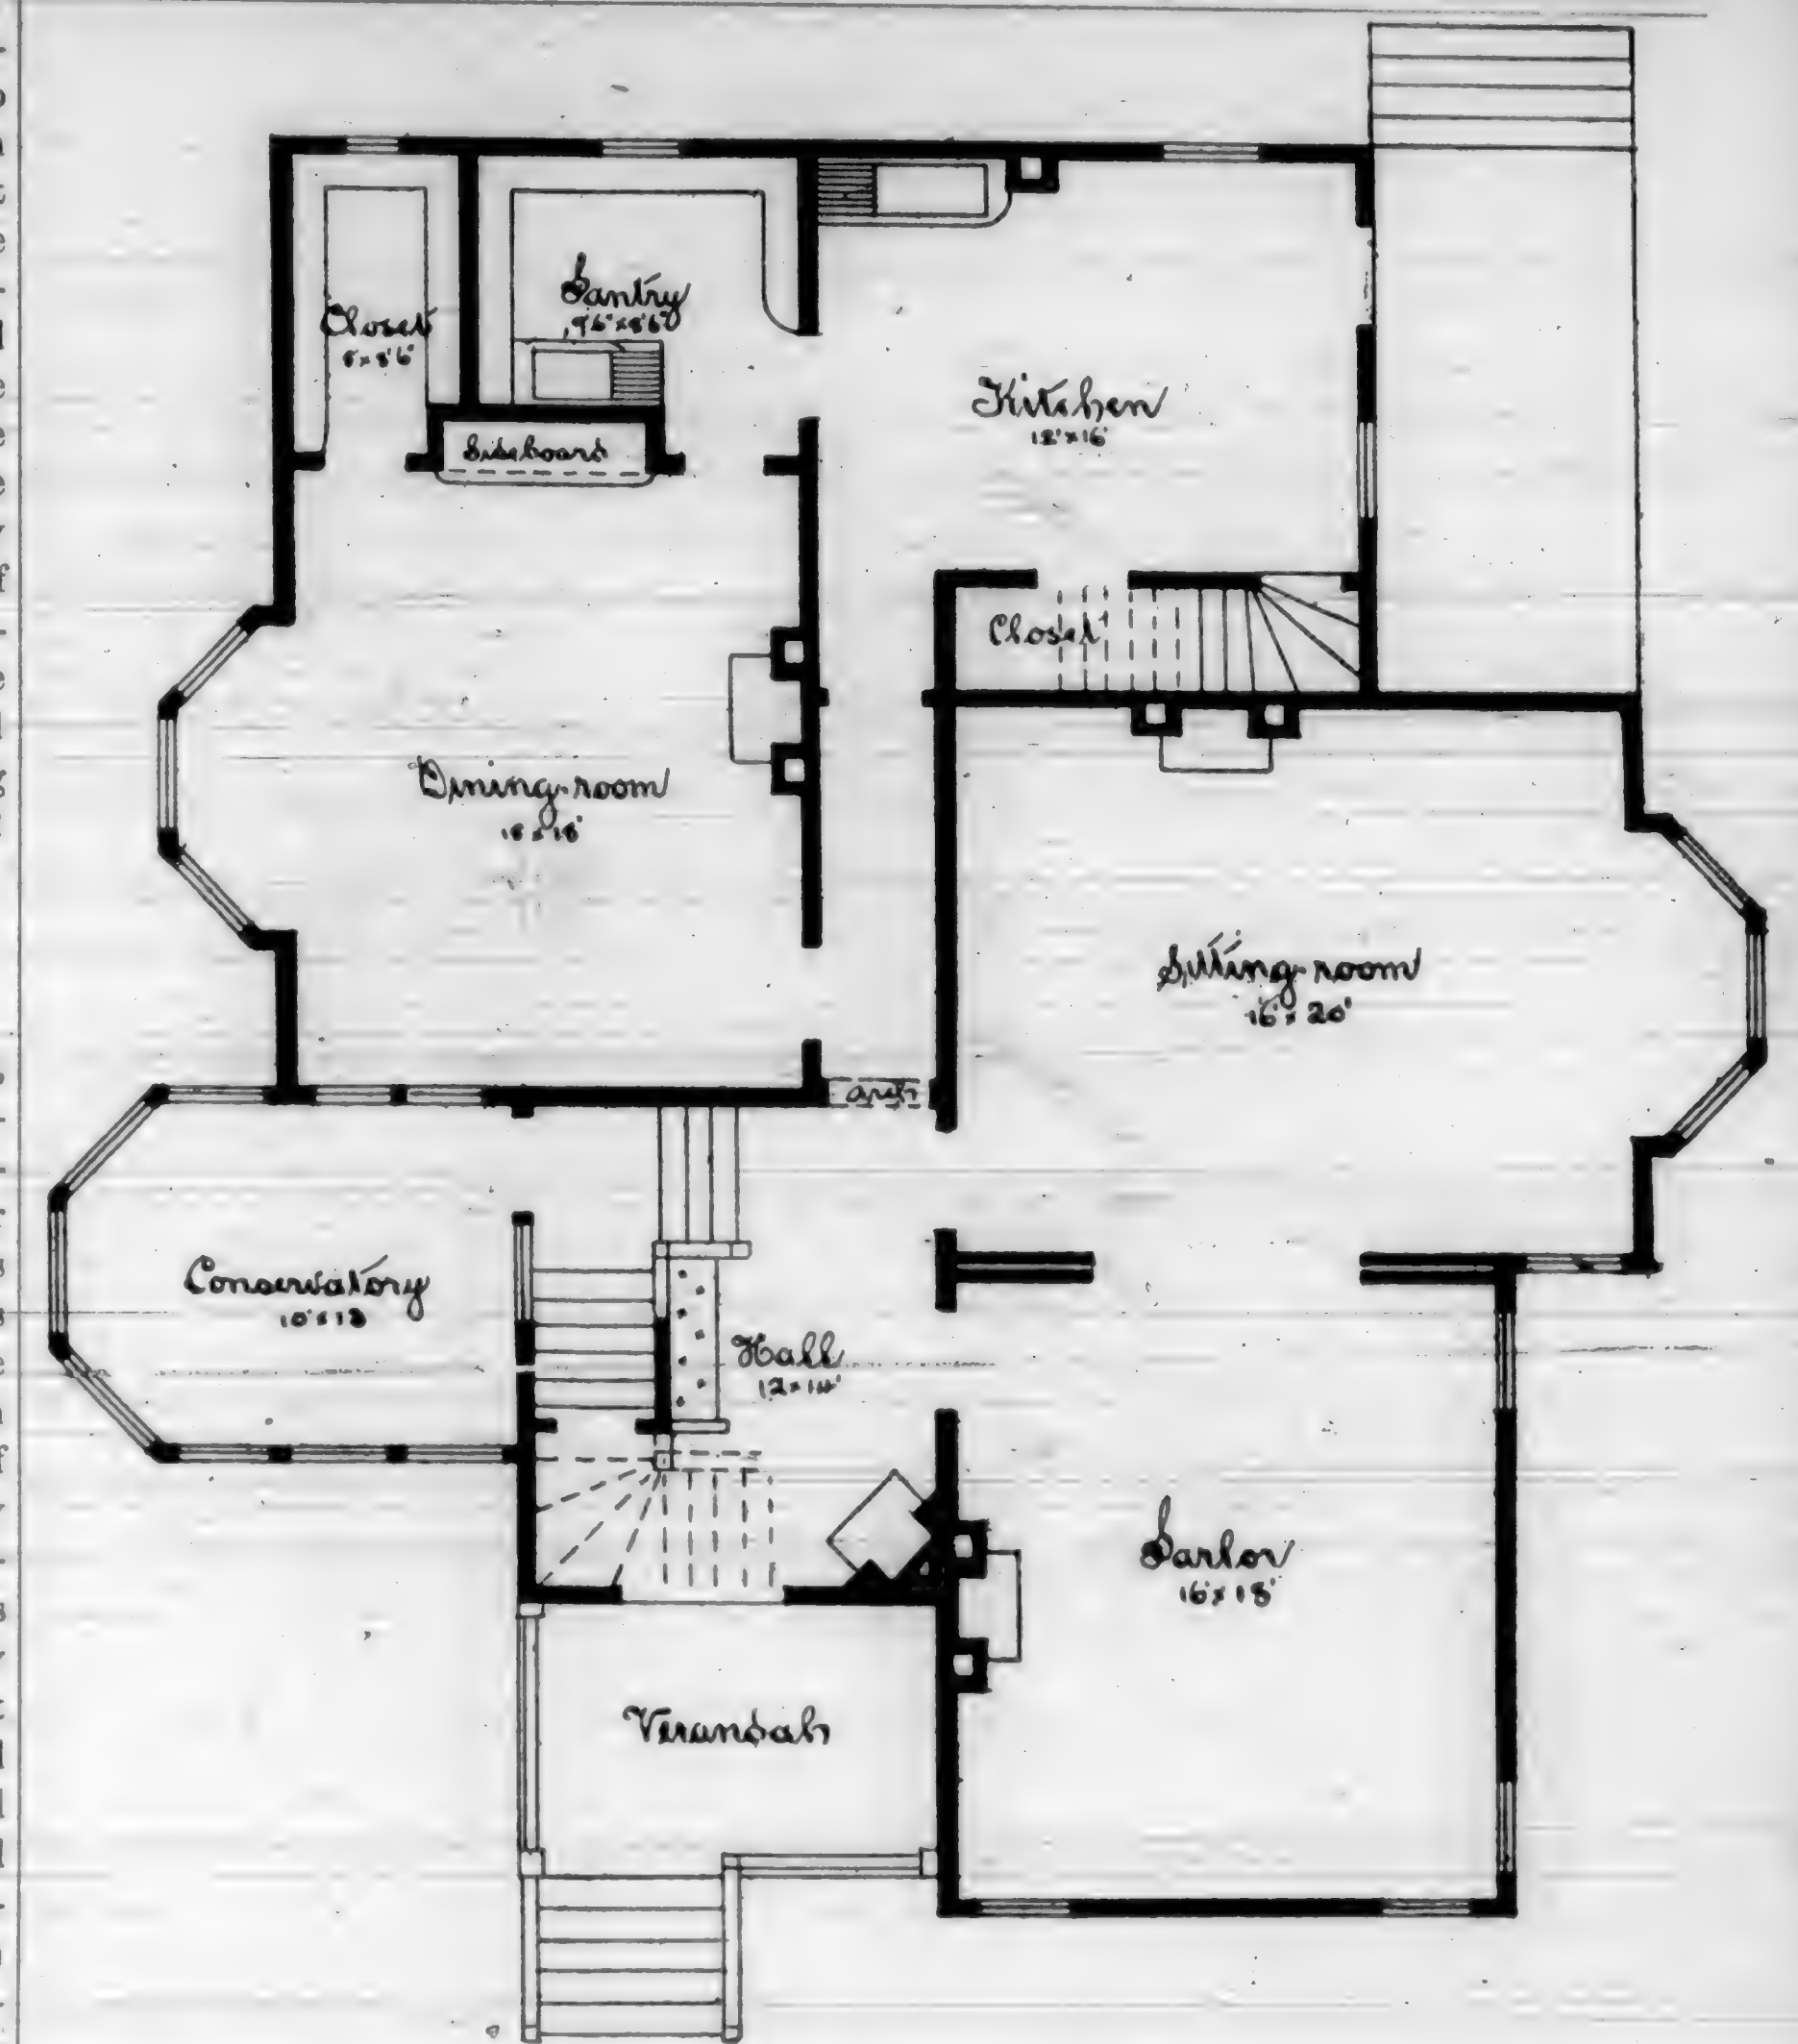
FIRST FLOOR PLAN OF SUBURBAN DWELLING.
